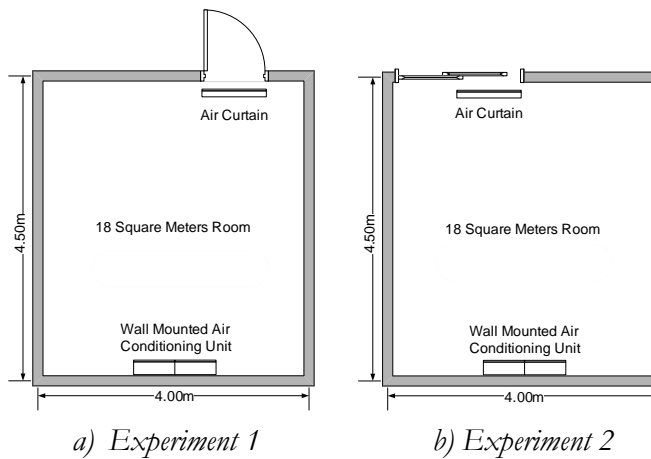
Floor Plan of a Single Door Opening with Air Curtain Experiment.
